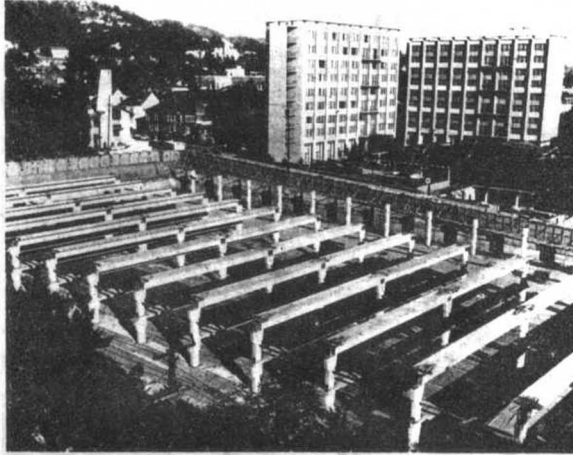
Precast prestressed concrete girders and columns form rigid frames for 62-ft span garage, University of California, Berkeley (Architect Anshen and Allen, Structural Engineer T. Y. Lin International, Consulting Engineers).
